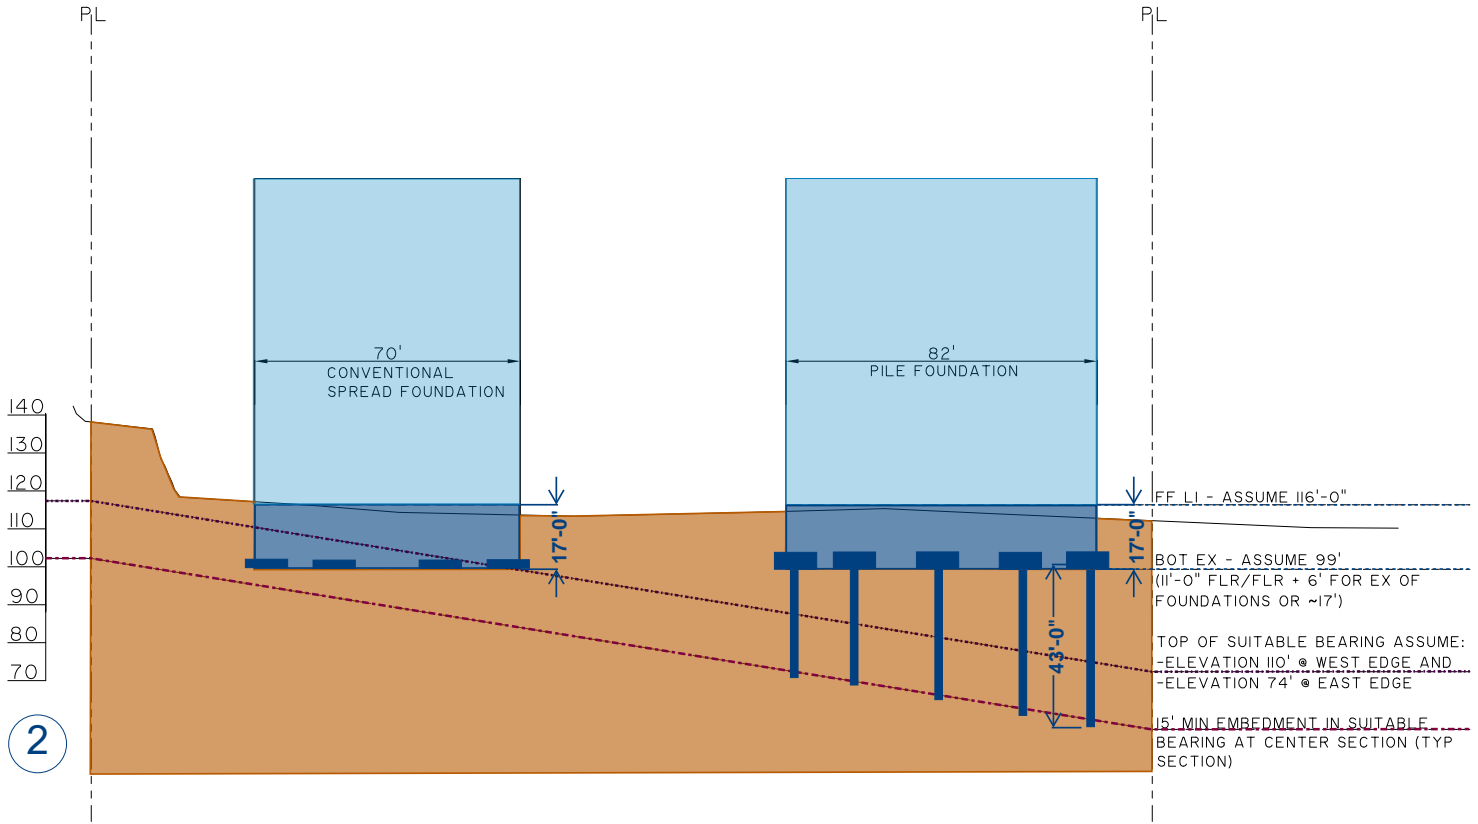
Spuds Concept 1, Section 2 Through West and East Building Excavation, Looking North
